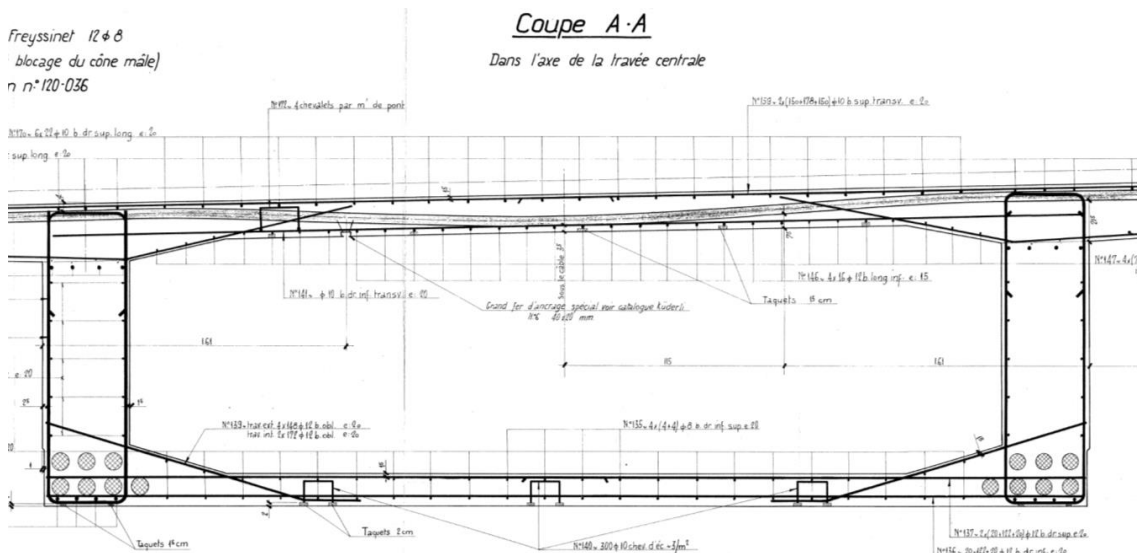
Transverse section of reinforcement at mid-span (Zoom of centre).
